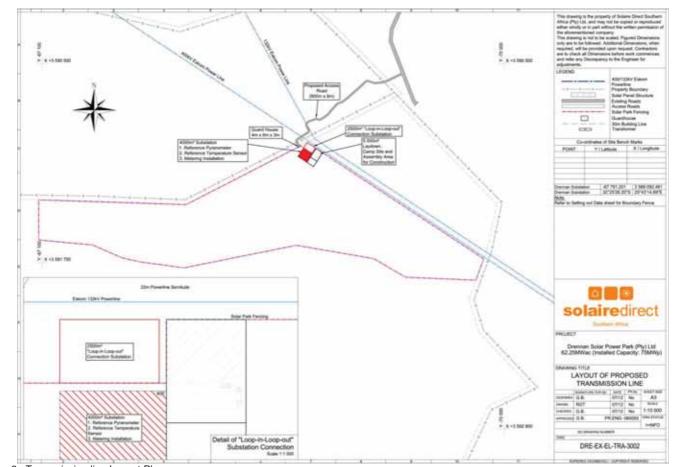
Transmission line Layout Plan PROPOSED DRENNAN PV SOLAR PARK
